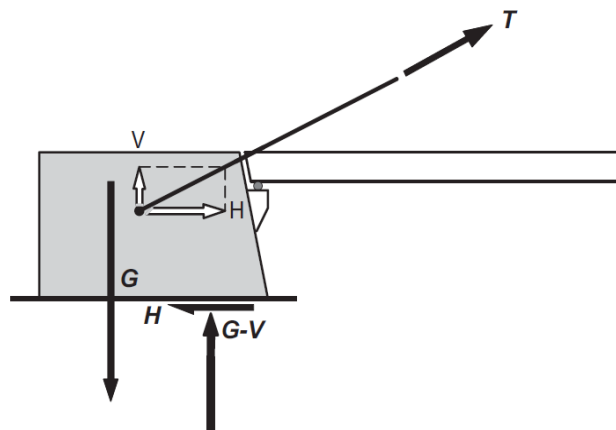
Mechanics at connection between anchor cable and anchor block in an earth-anchored system as Gimsing and Georgakis (2012).
